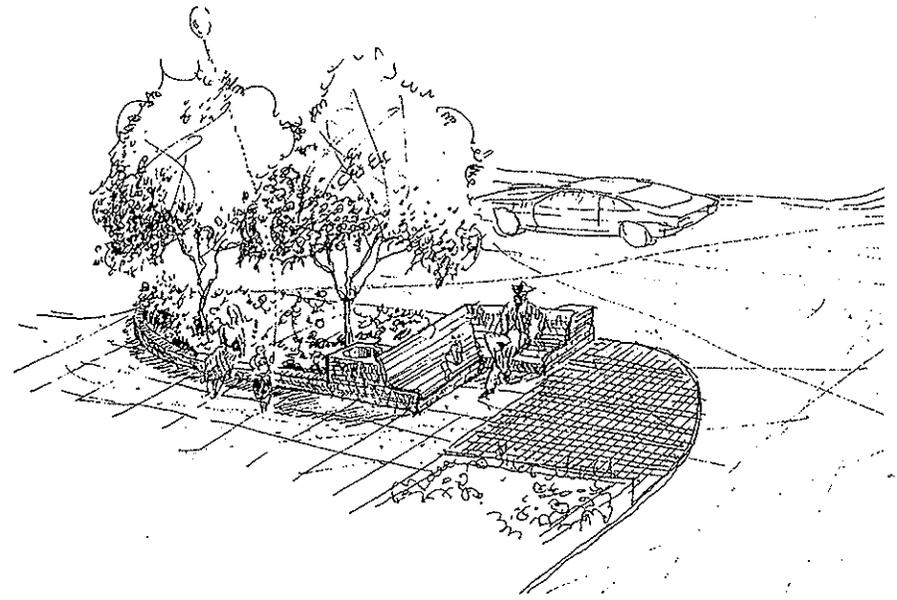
VIEW OF TYPICAL BENCH & PLANTER
